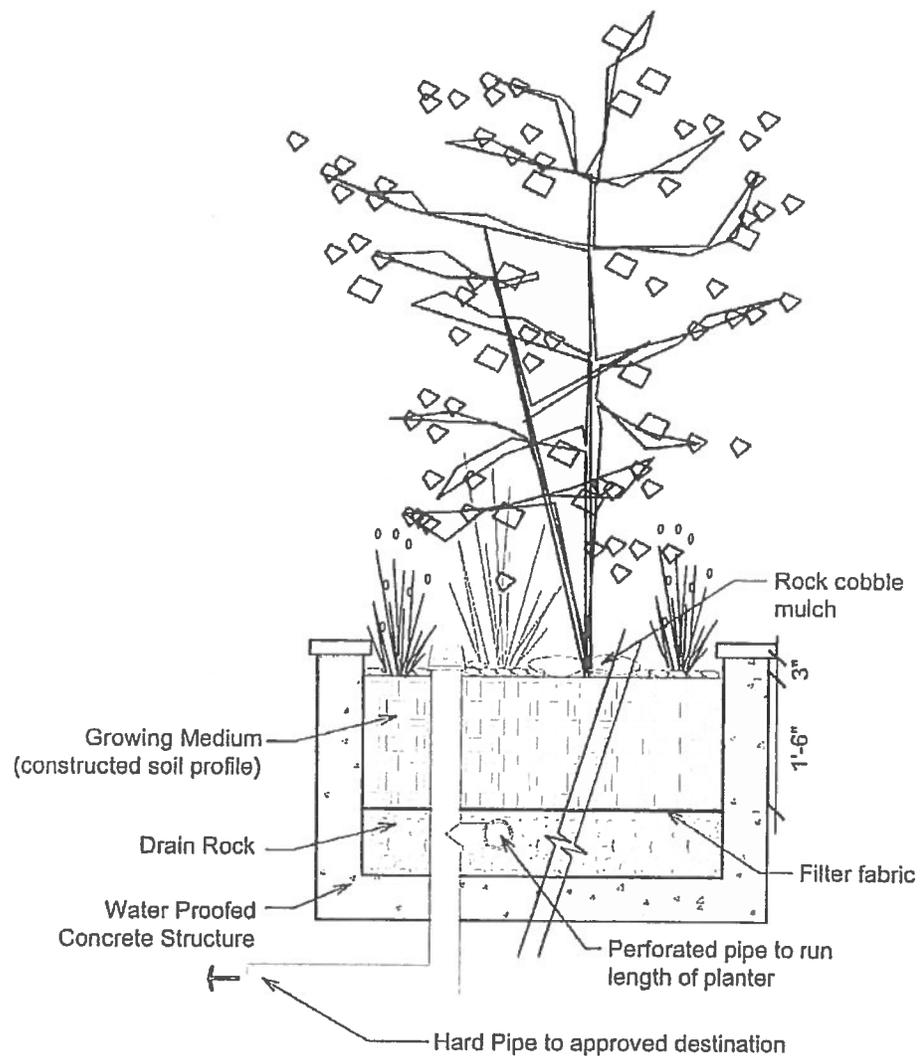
FLOW THROUGH PLANTER DETAIL (EXAMPLE)
